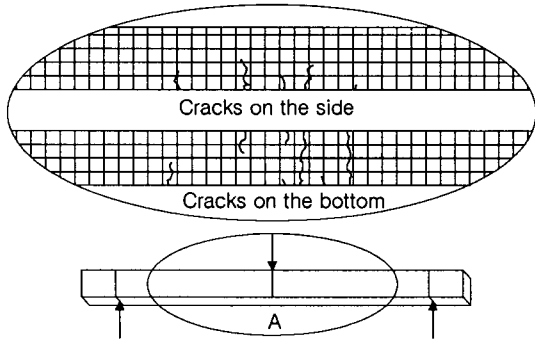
Crack patterns of specimen at loading 50kN (simple beam)
